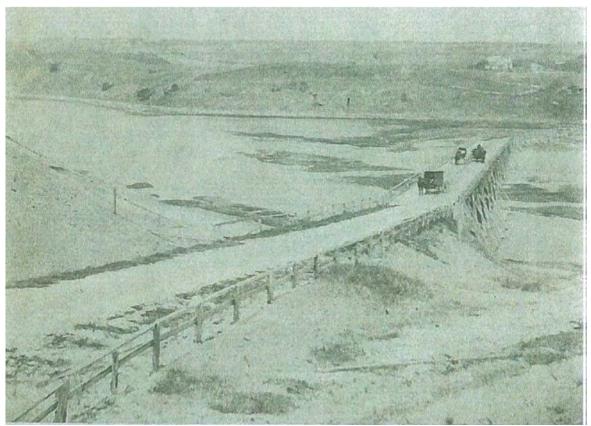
Historic Photo of Bridge Crossing at Orleans Road (Route 28) over Muddy Creek Facing North Toward Harwich, circa 1871.
